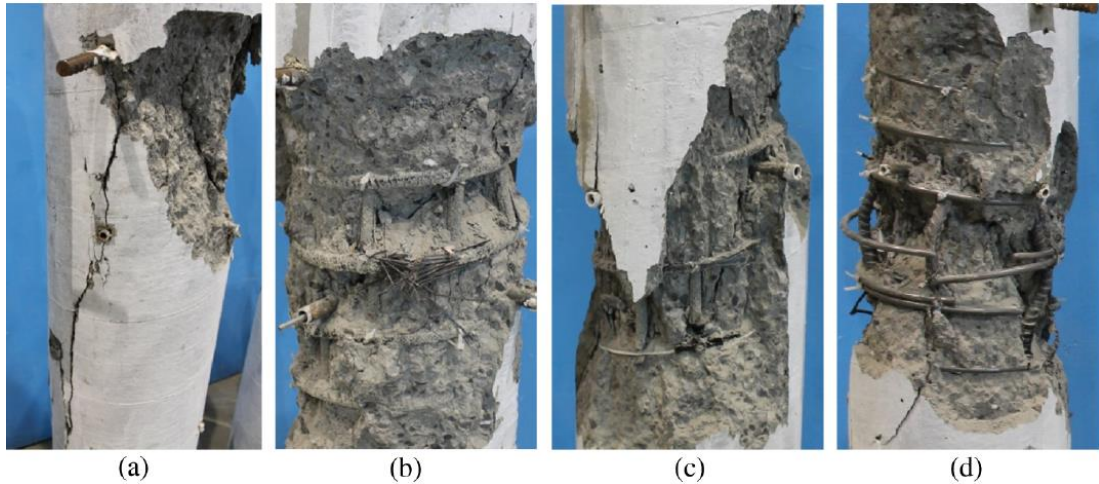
Failure of the columns: (a) plain concrete; (b) rupture of CFRP helices; (c) inclined plane failure and rupture of longitudinal CFRP bars; and (d) buckling of longitudinal steel bars and rupture of helices⁴⁸
